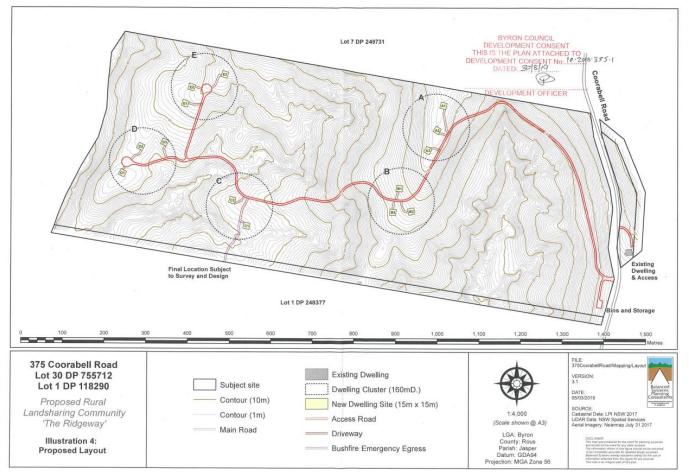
DA 10.2018.355.1 – Approved Layout of Multiple Occupancy
